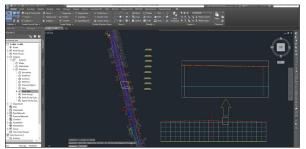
Road surface and Designed cross sections in AutoCAD Civil 3D
